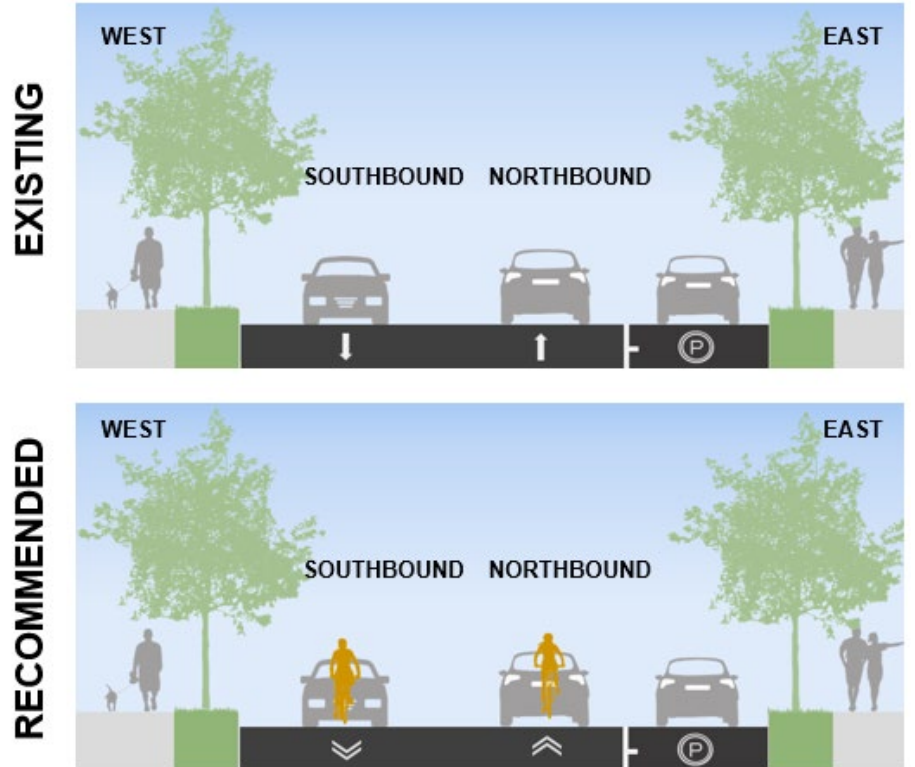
Existing and recommended cross-section for Foch Avenue
